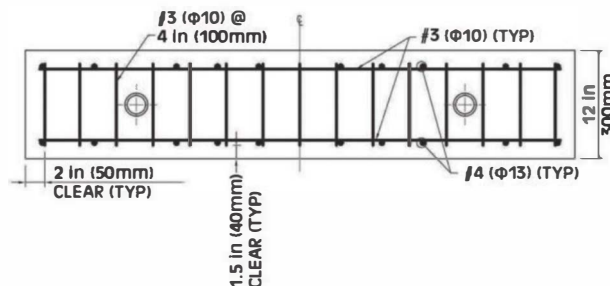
Typical plan view of transverse and longitudinal bars in precast concrete tunnel segments.
